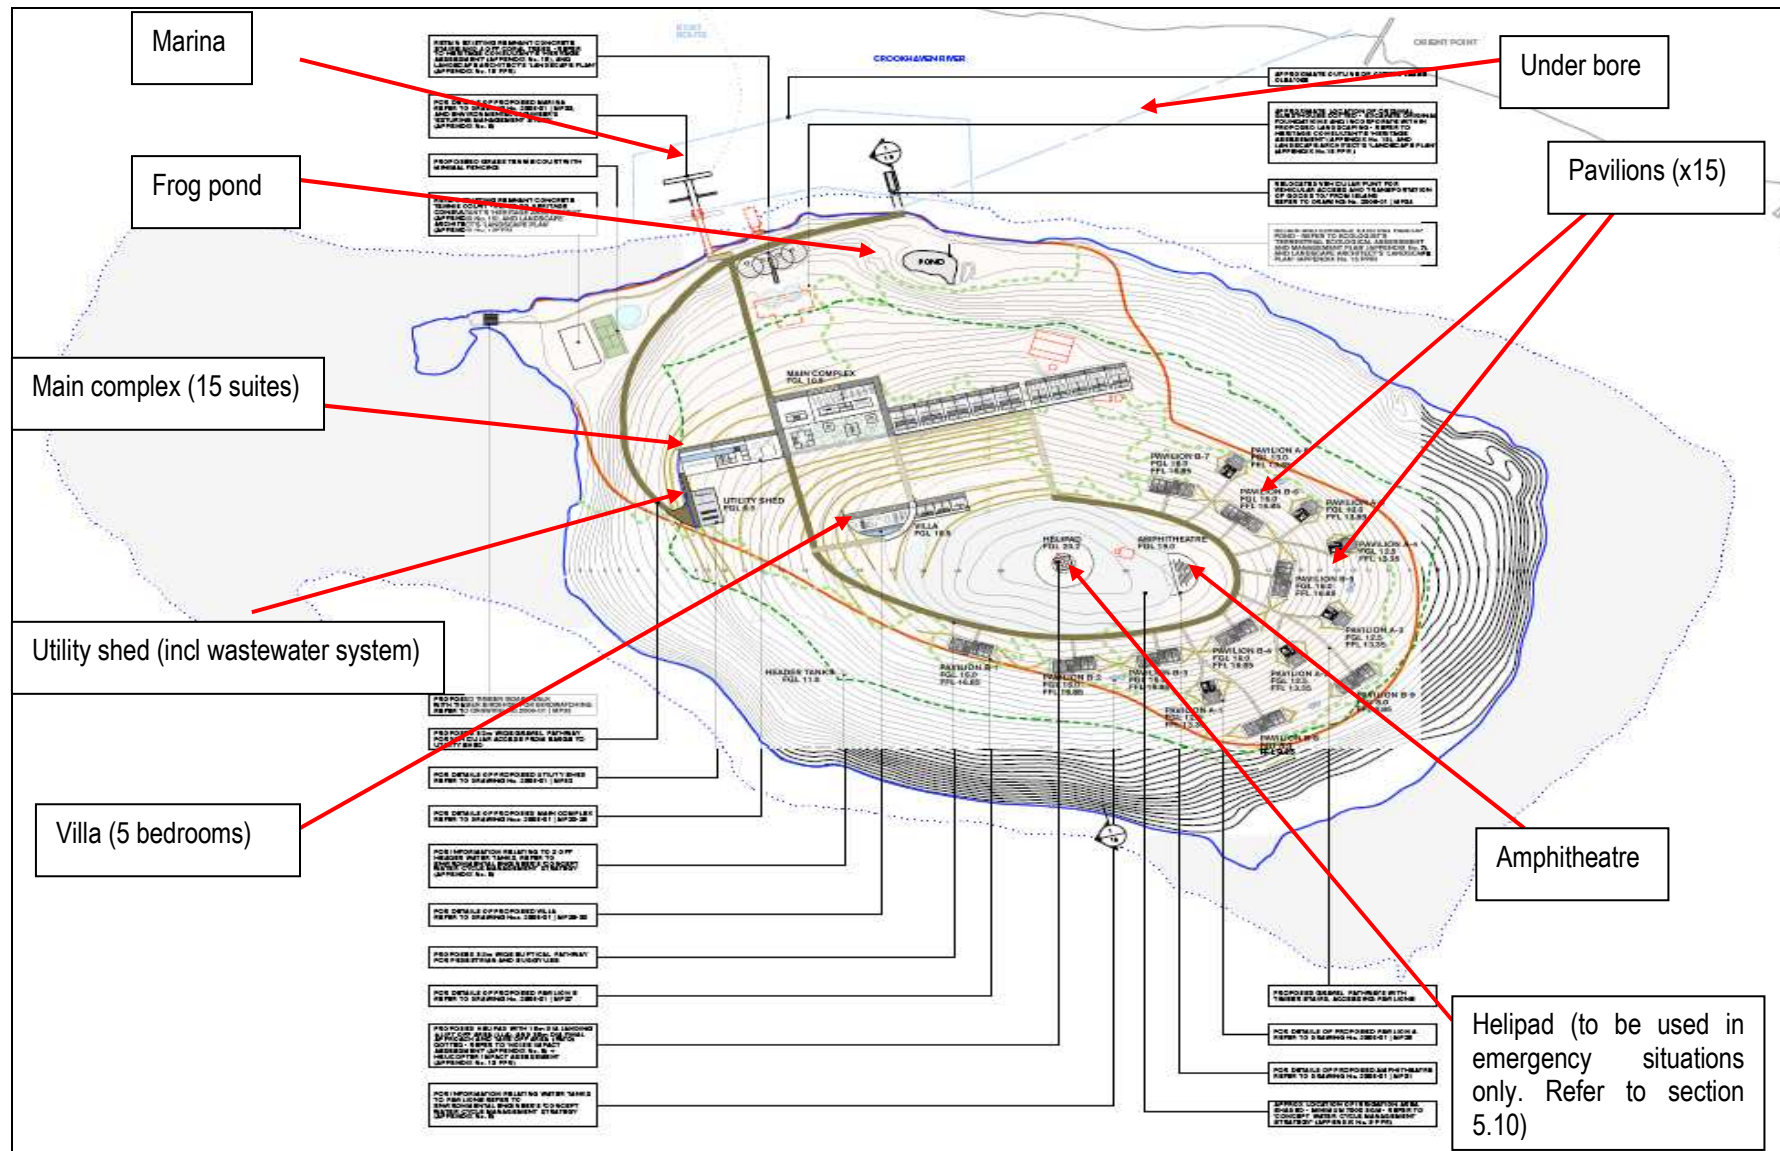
Proposed Development at No 76 & 84 Greenwell Point Road
